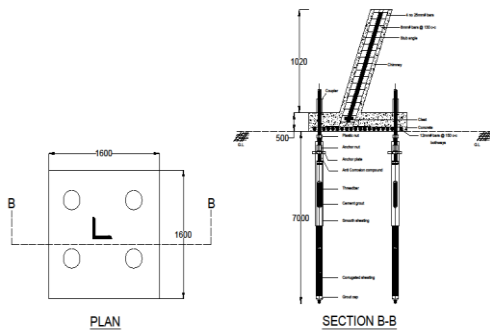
Plan, Section of Hard Anchor Foundation (Non-Prestressed)
